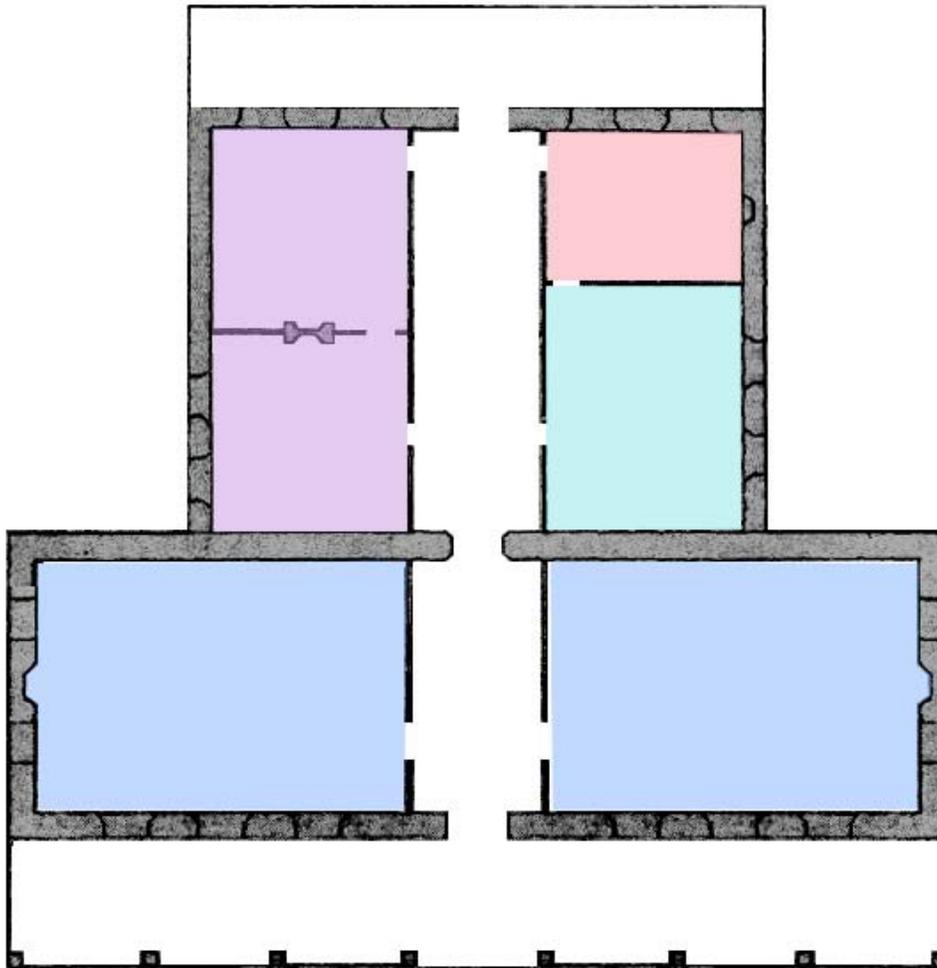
Hospital floor plan, Benicia Barracks, California 1854 (NARA College Park, RG 77 MISC Fort Files Benicia Barracks).
